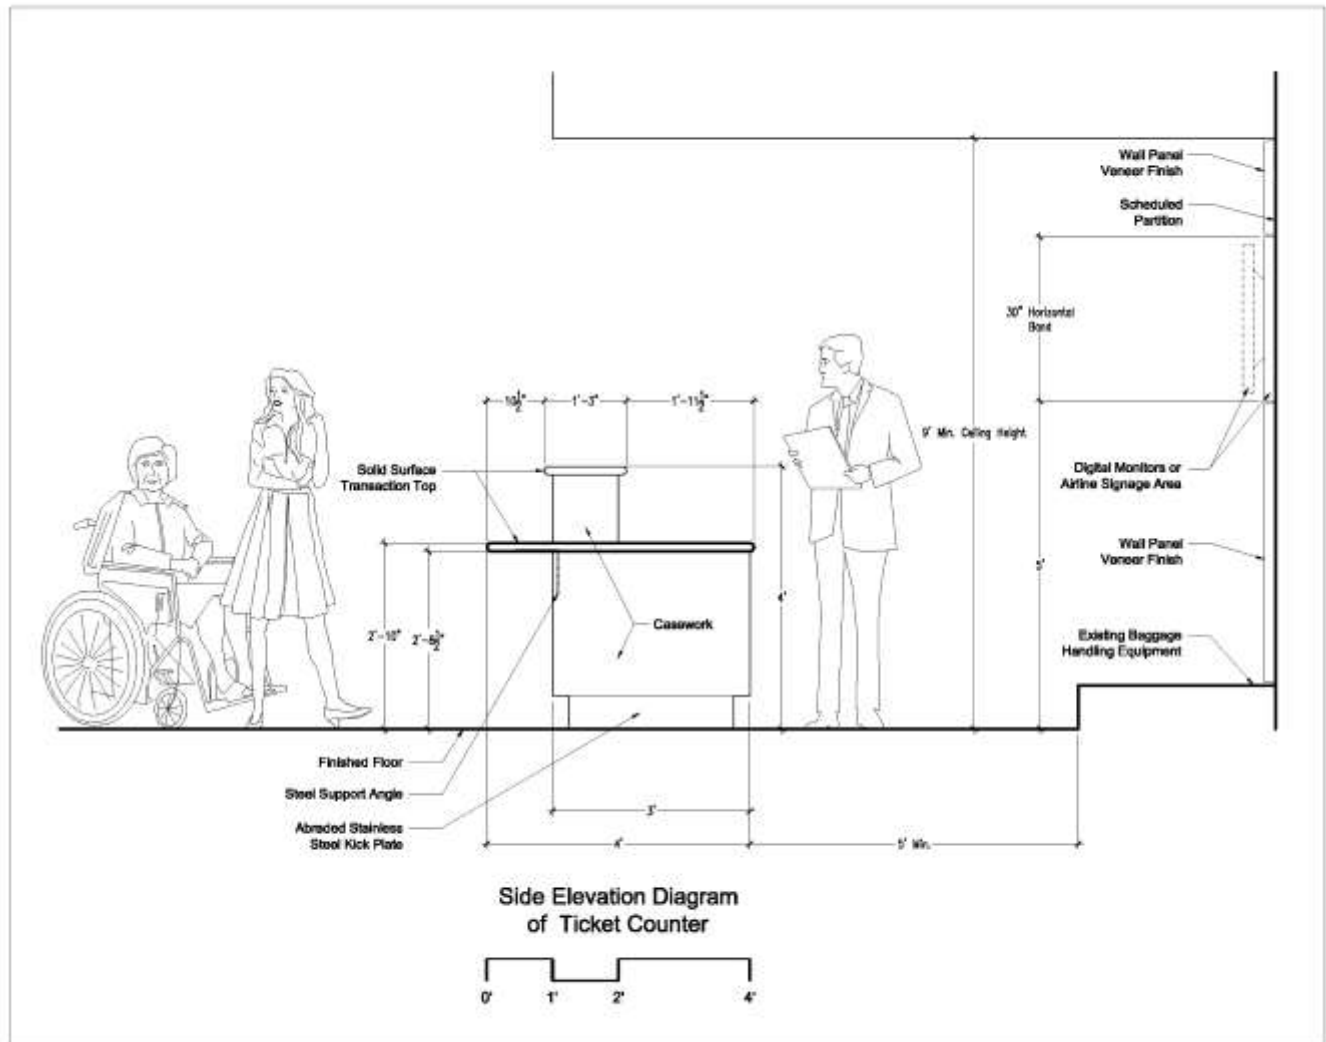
Side Elevation of New Concept for FLL Terminal Ticket Counter
